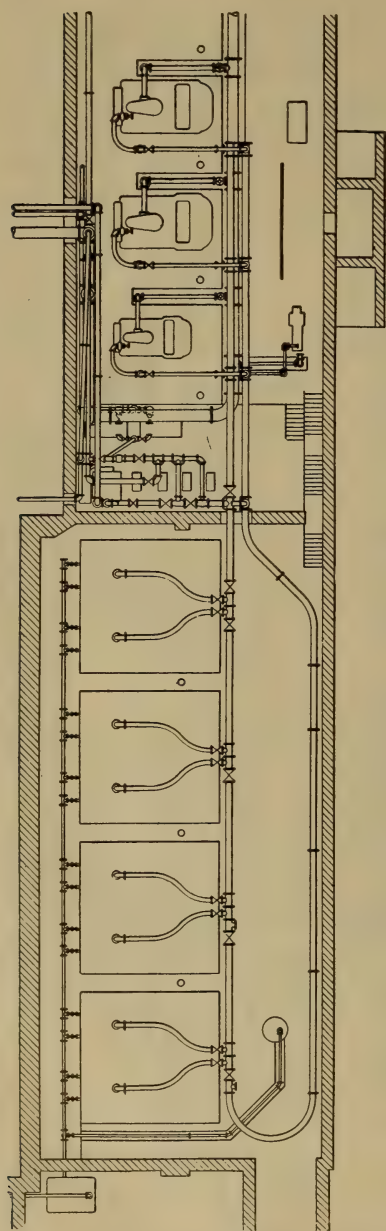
Plan of High-pressure Piping, Princeton University Power Plant.
